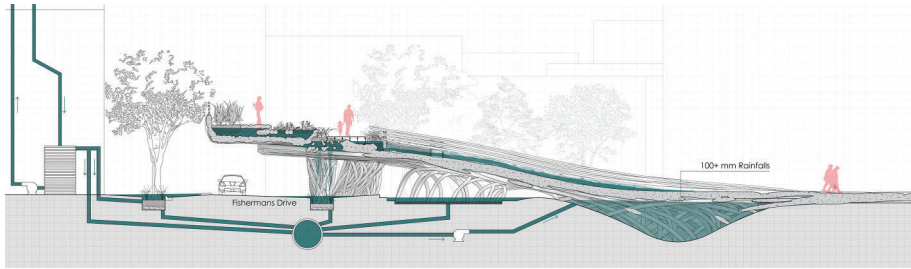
Section: Proposed structure mediate flooding issue on the test site.
